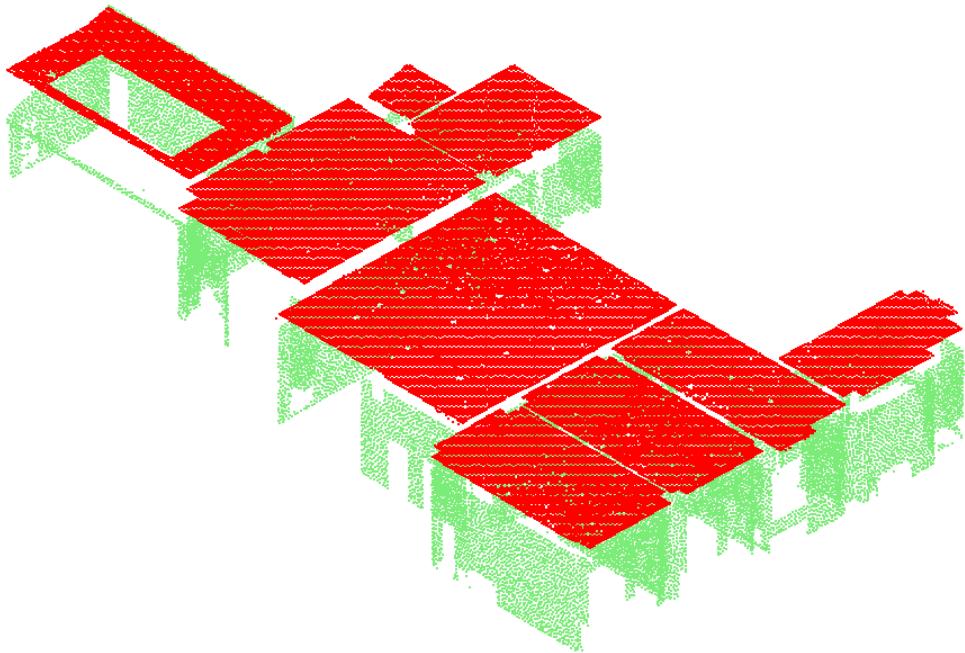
3: 3D view of ceiling and wall semantic point cloud
